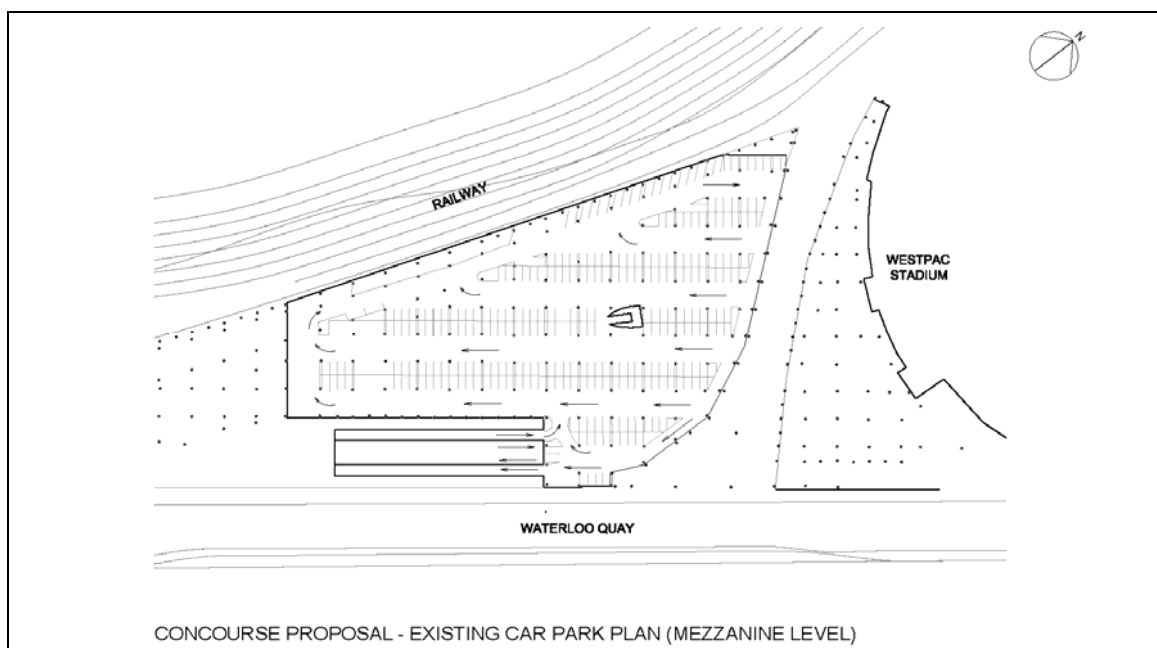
Concourse Proposal – Existing Carpark Plan (Mezzanine Level)
